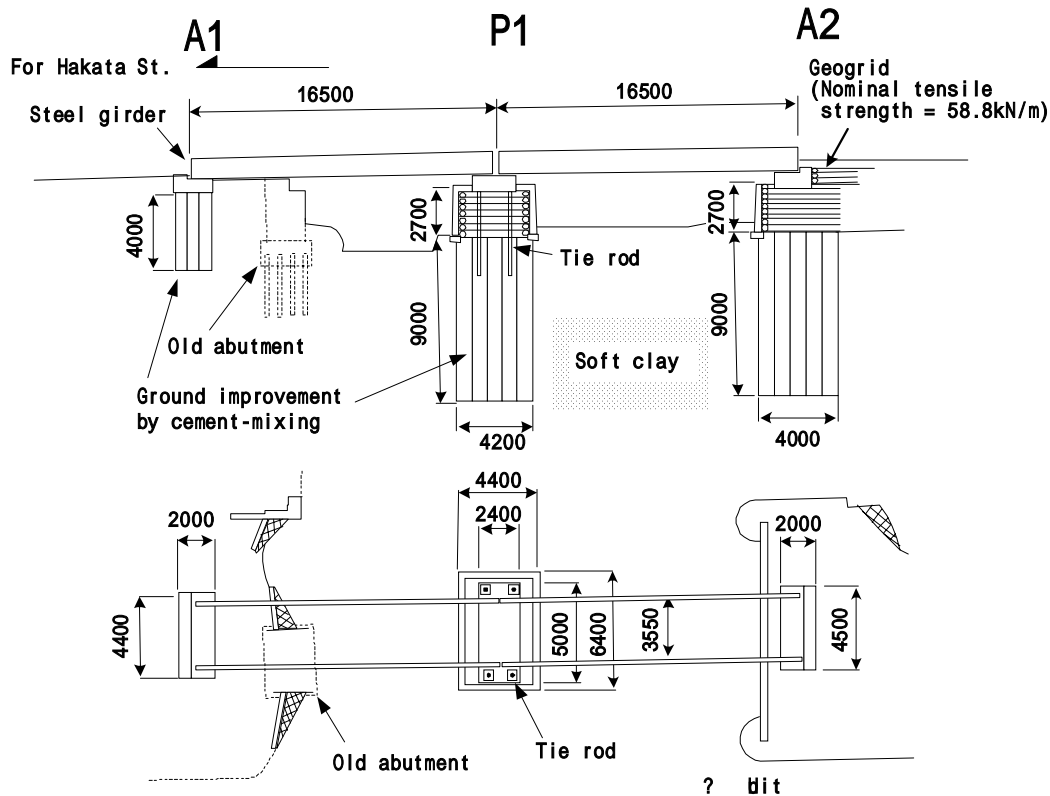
Maidashi bridge with a PLPS GRS pier and a GRS abutment (Uchimura et al., 2003).
